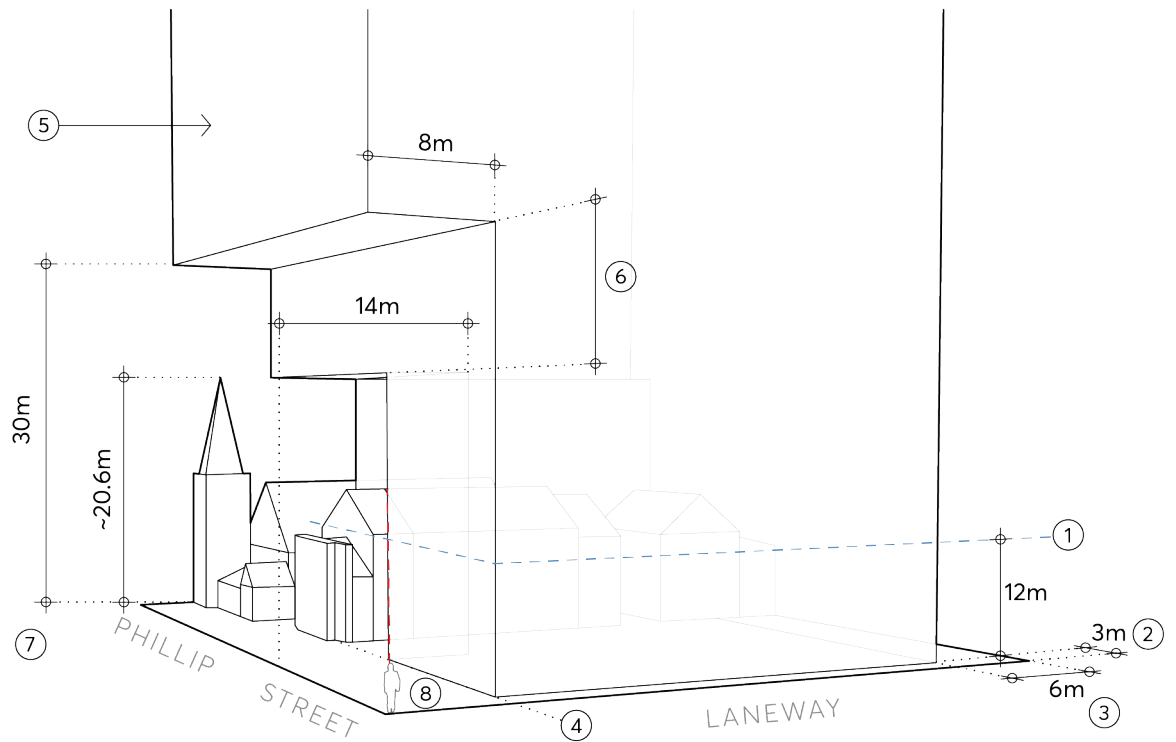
Maximum building envelope – Ground plane view from laneway (viewing west)
